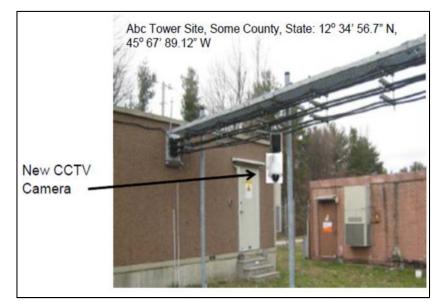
Ground-level photograph with graphic showing proposed equipment installation.
